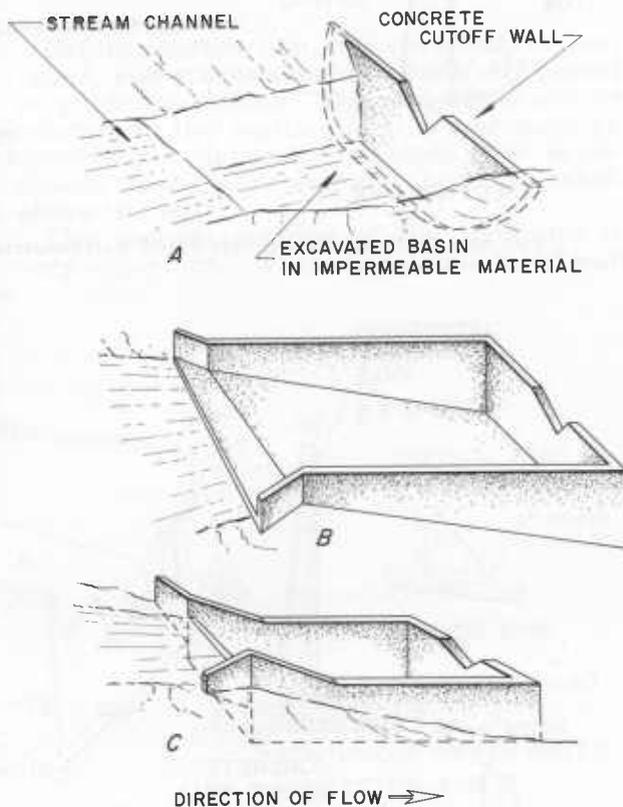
Three types of weir basins: A, Weir basin formed by simple cutoff wall spanning stream channel; B, weir basin formed by watertight box with front wall, two sidewalls, and floor with open upstream end; C, weir basin formed by sunken watertight box with four sides and floor.
